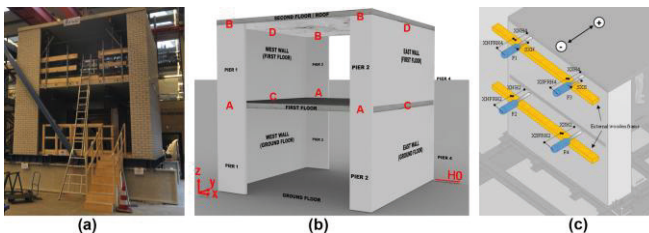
Experimental configuration, (a) a full-scale test specimen, (b) labelled components, and (c) four actuators as loading instrumentation [5]
